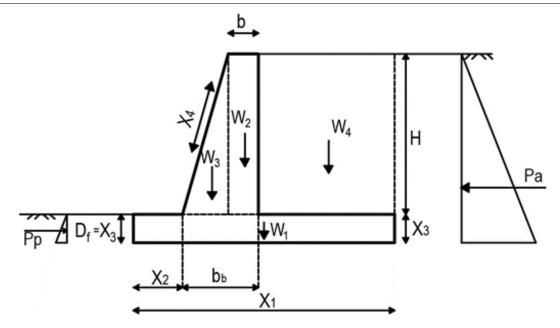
Cantilever Retaining Wall Dimensions and Acting Loads
